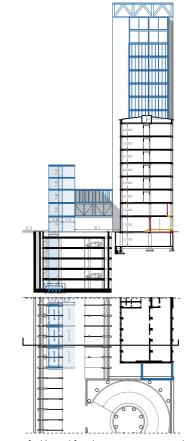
Projection of additional foundation on existing carpark plan 1:1000
